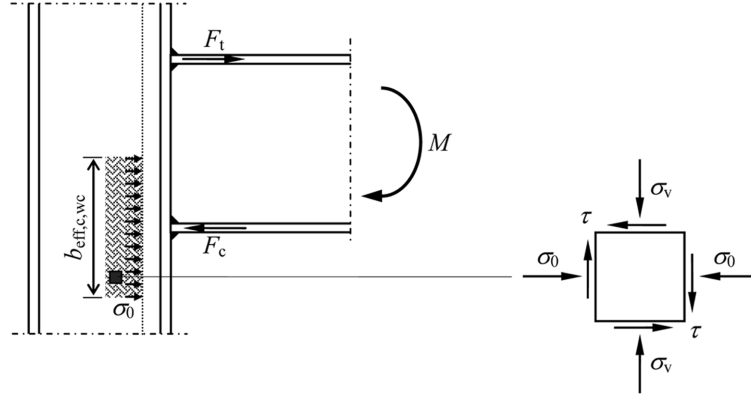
Stresses in the compression zone of a beam-to-column joint
